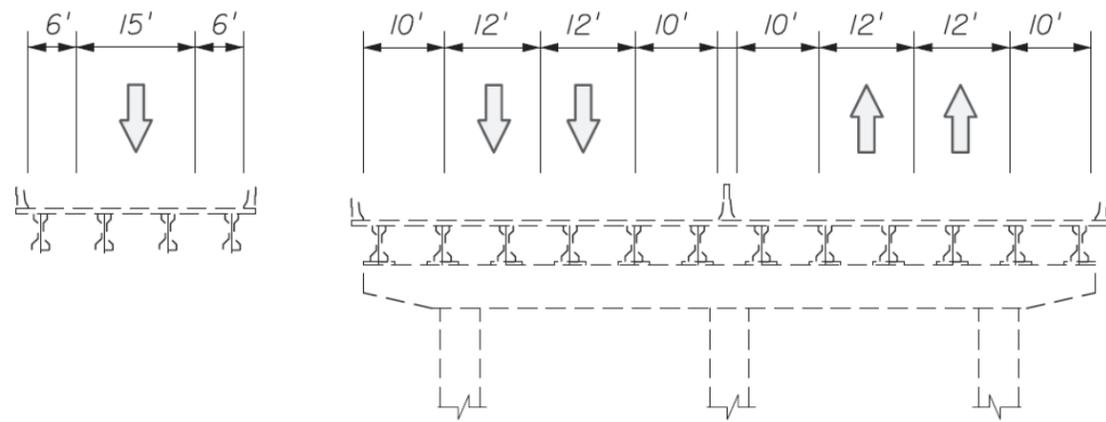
Existing Bridge Over SW 88<sup>th</sup> Street/Kendall Drive
